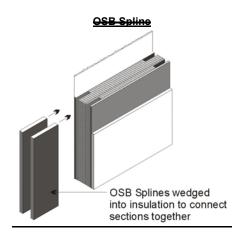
Structurally Insulated Wall Panels (SIPS)
